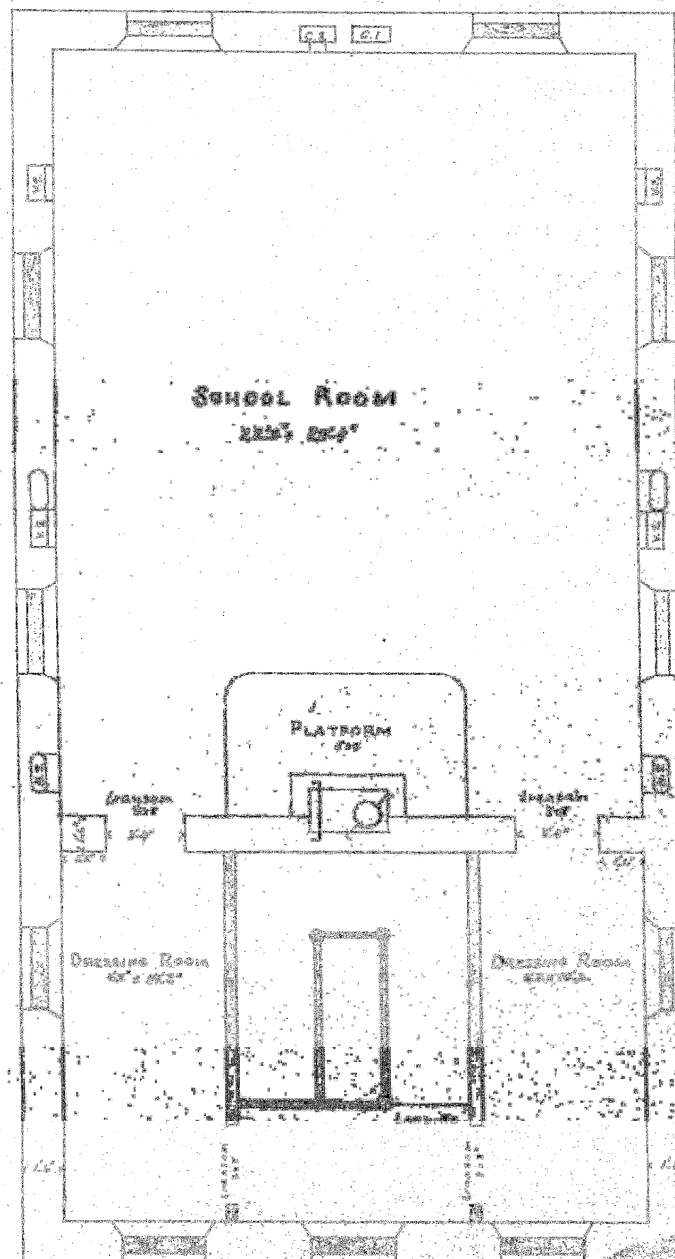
Original Second Floor Plan, John Haskell, 1871.
